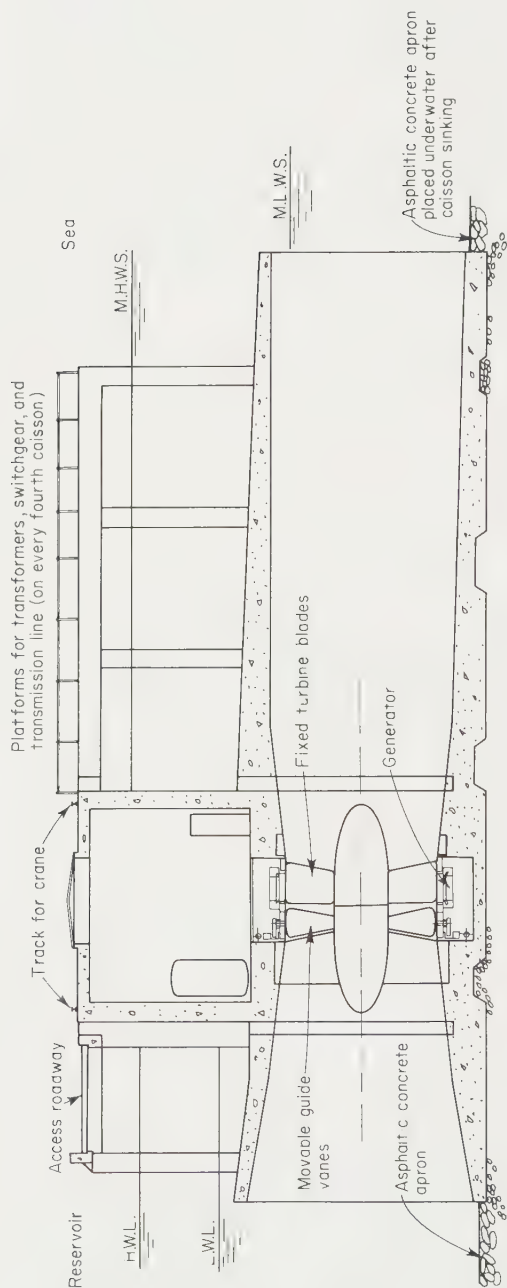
Longitudinal section through caisson unit with a straight-flow turbine, as proposed for Solway Firth project, 1964.
